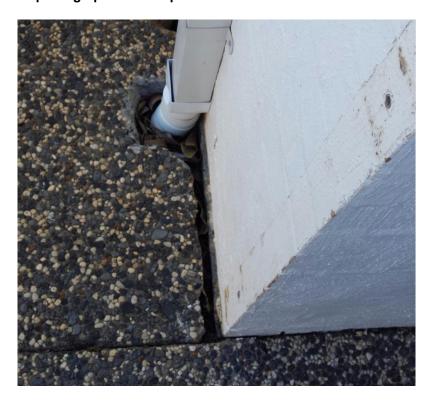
Separation of the 1.3metre wide path from the wall on the western side of the house as photographed on 27 April 2018. The does not appear to have been any significant change since April 2017.
